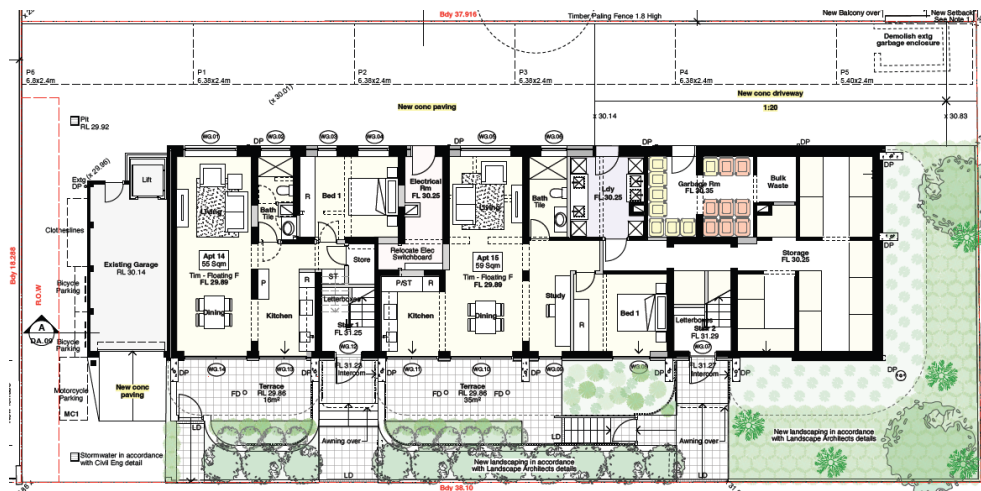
Proposed ground floor plan – 10 Major Street, Coogee (Source: Ken Powell Architect)
